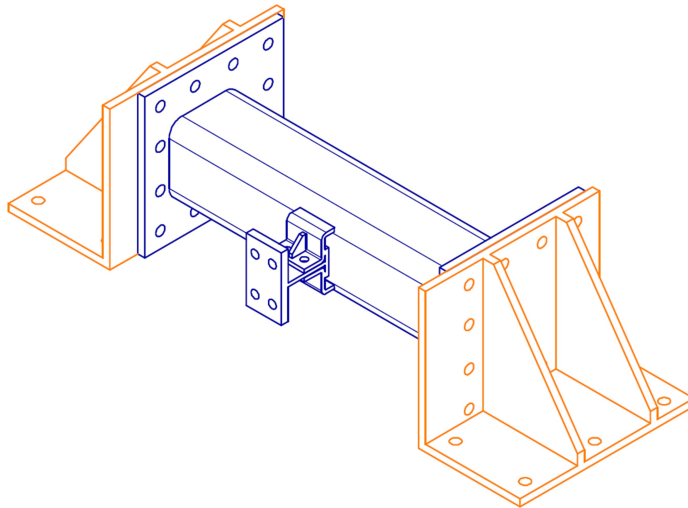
Tubular specimen (blue) to corner profile (orange) detail
